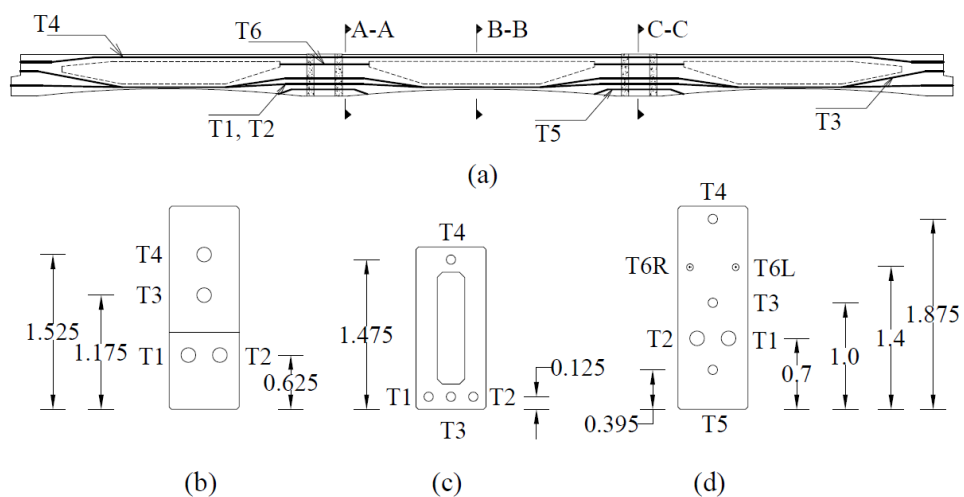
Details of post-tension tendons: (a) geometry and reinforcement layout of the test-structures, (b) section at A-A, (c) section at B-B, and (d) section at C-C.
